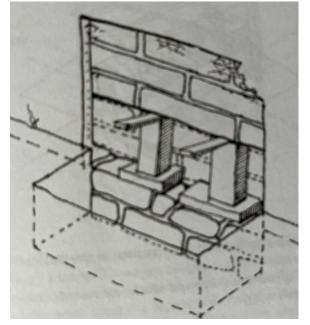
Provide wood blocking and shims to support the adobe wall above the work area. Image courtesy of Cornerstones (page 103).
